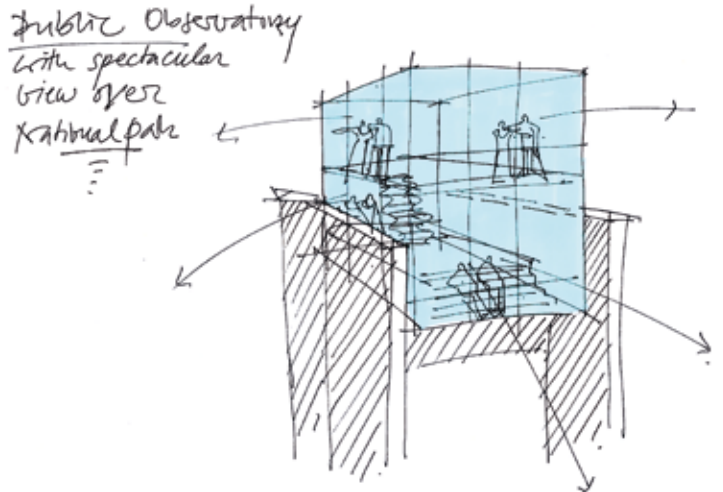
Tower, observatory, concept sketch, Uwe R. Brückner
